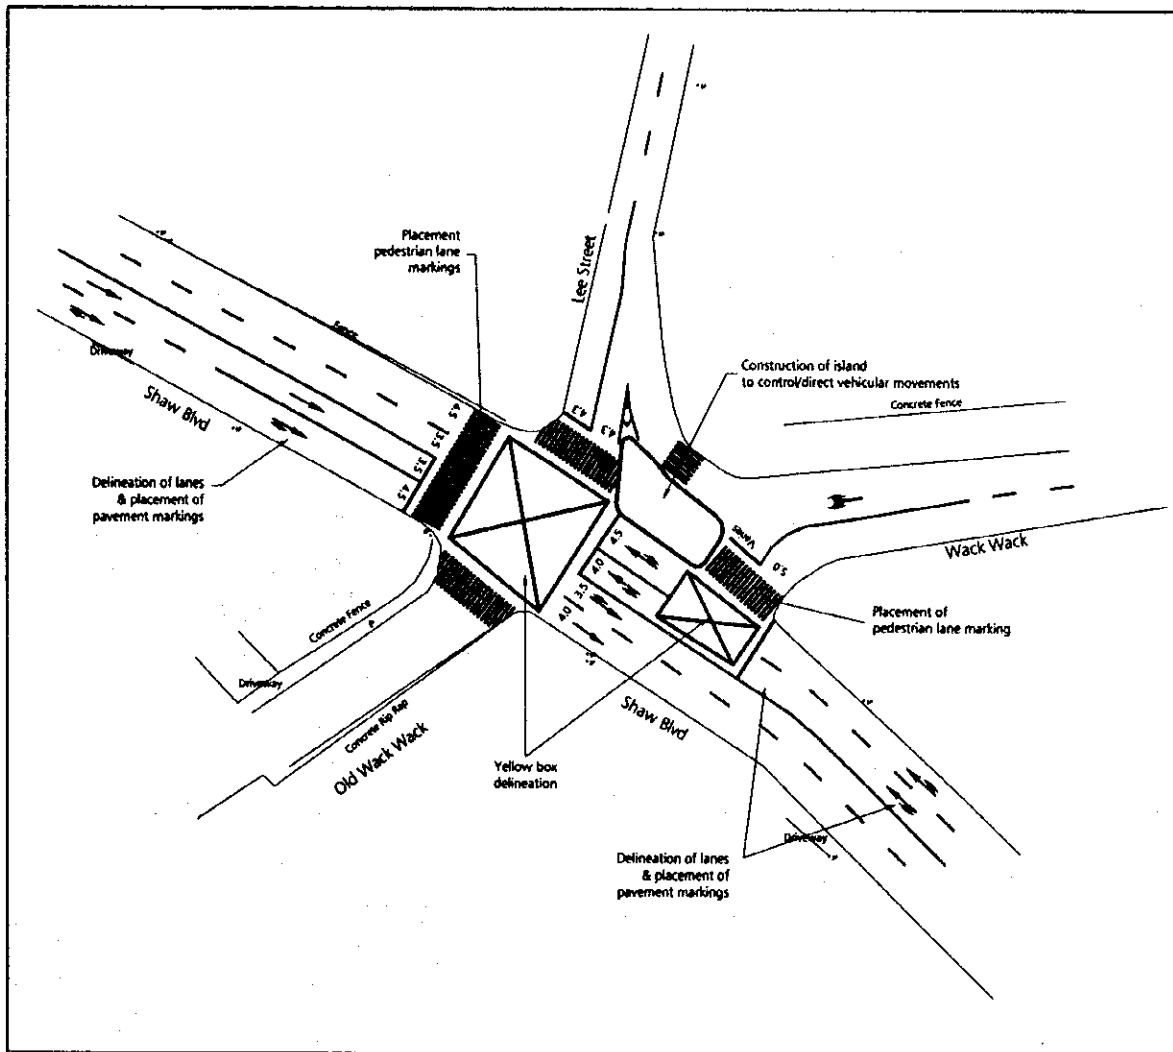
The Primer for the Wack-wack Road - Lee-St - Shaw Blvd Pilot Project
